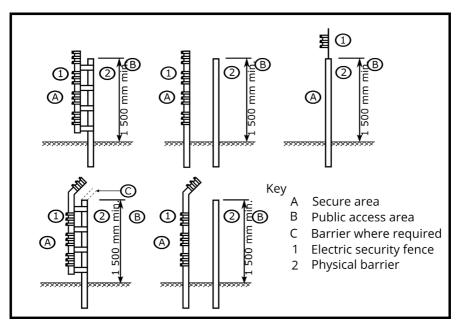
Typical Constructions where an Electric Security Fence is Exposed to the Public
